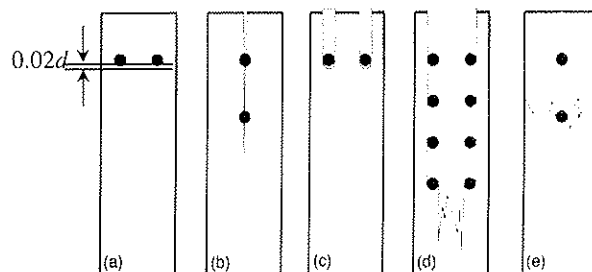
Failure modes in wood for connection with dowel-type fasteners according Fahlbusch (1949).
